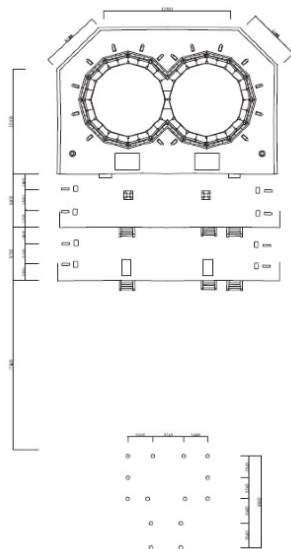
Floor plan of Hu-reung (NICH, 2009, 306)
